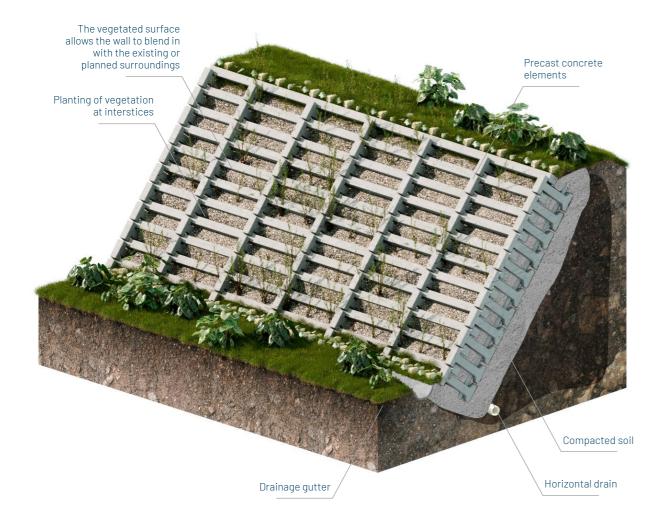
Prefabricated cribwall with vegetation (Source: Guajava).
